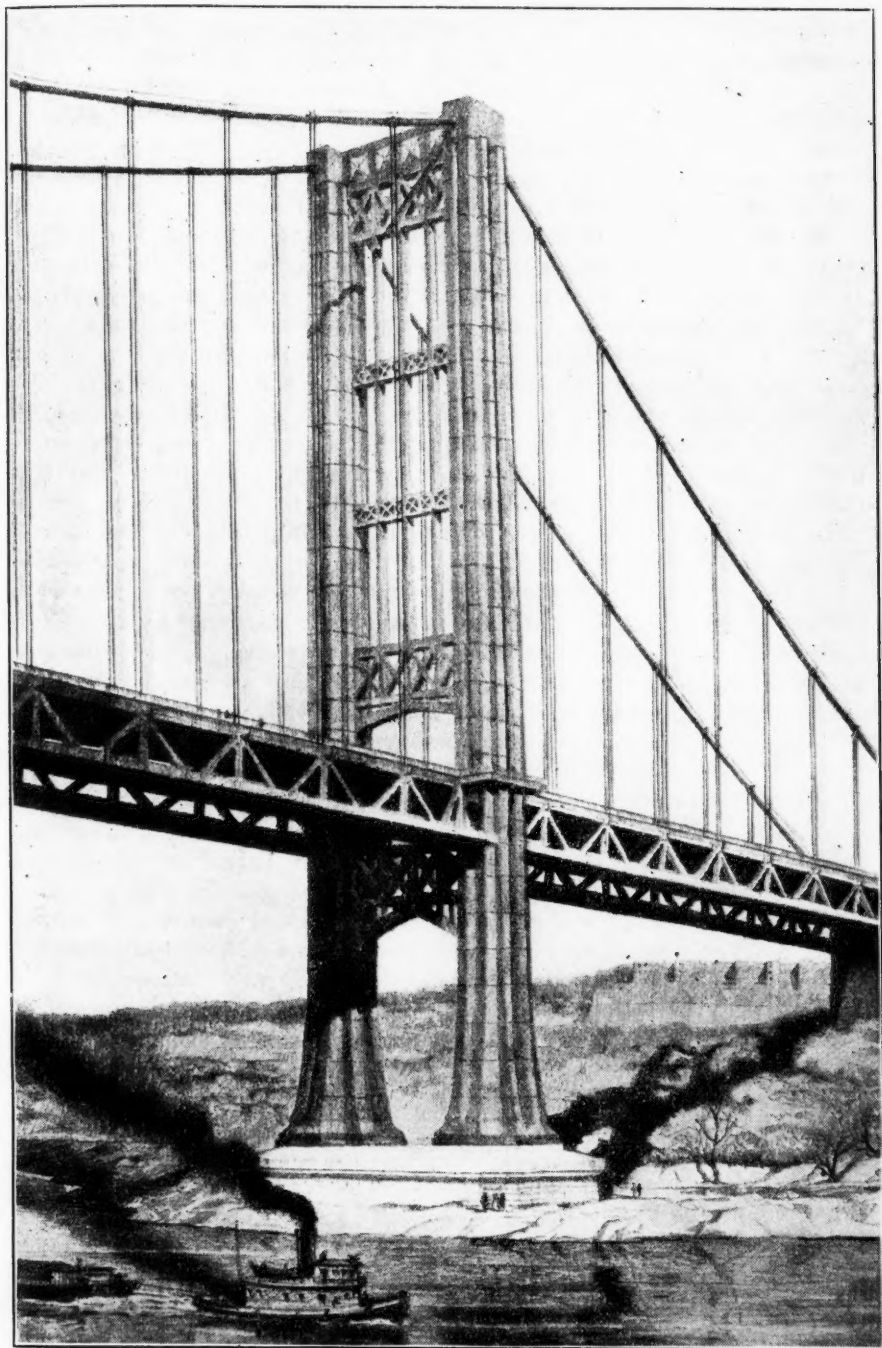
STUDY OF SLENDER TYPE OF STEEL TOWER.
